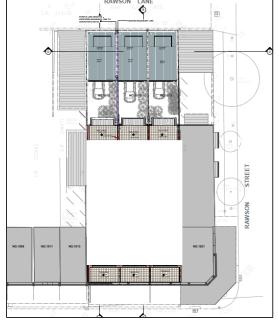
Proposed First Floor residential tenancy with detached ancillary media rooms fronting Rawson Lane
